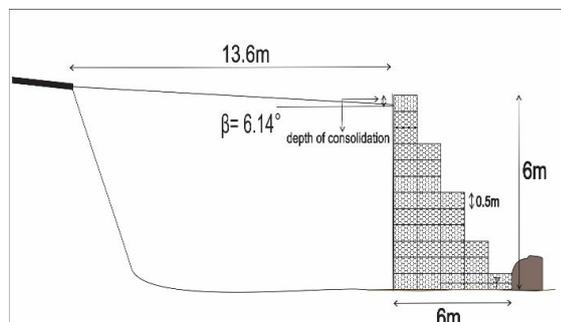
Plan view of the gabion retaining wall after sliding
